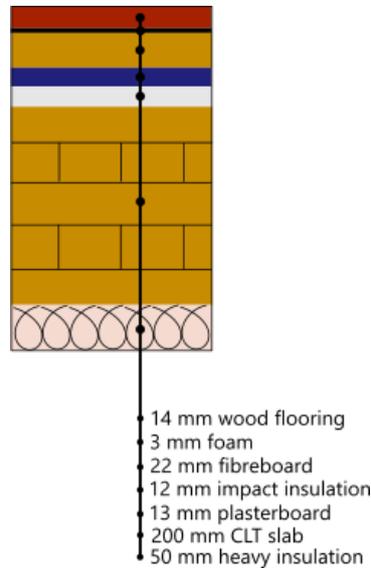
Floor Structure of KasseNova aan de Vaart - Design Variant 1
